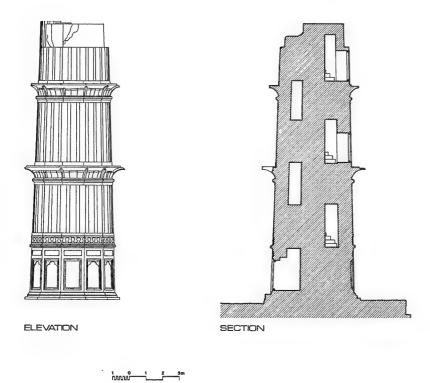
Elevation and section of the Hashtsal Minar, Delhi.
